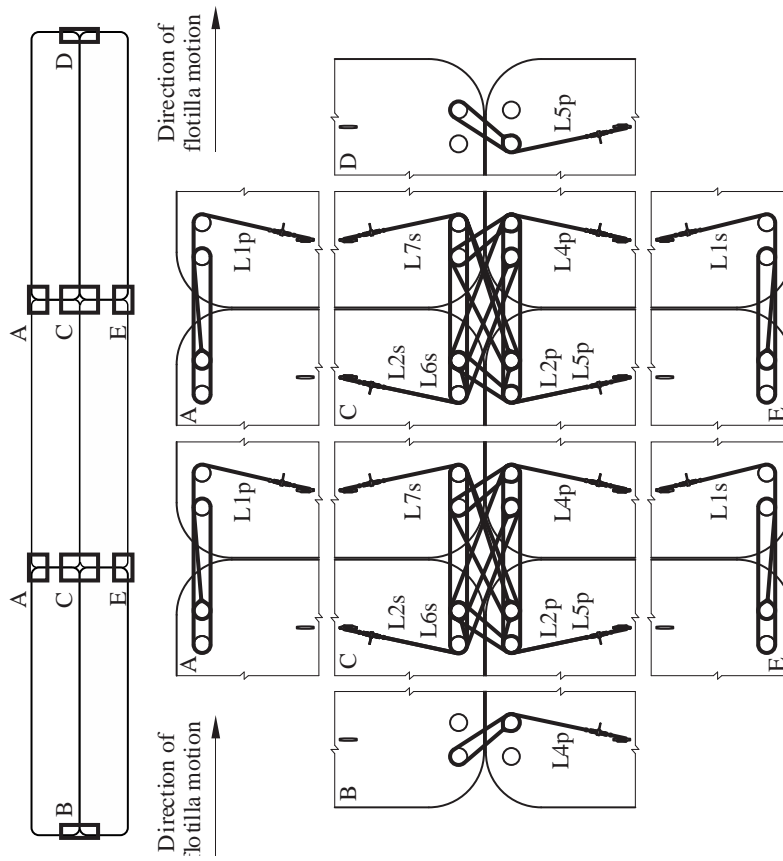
Lashing configurations for 2x3 flotilla used in pile founded guide wall study
